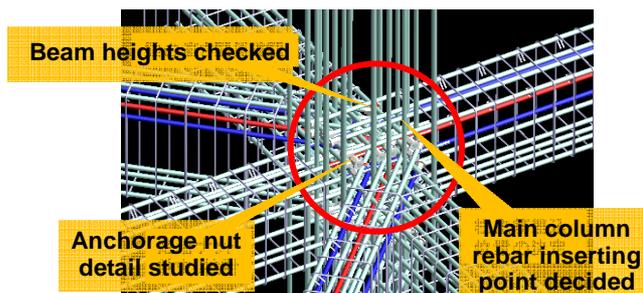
Rebar detailing study: Connection of diagonal beams to PC sub-beams
